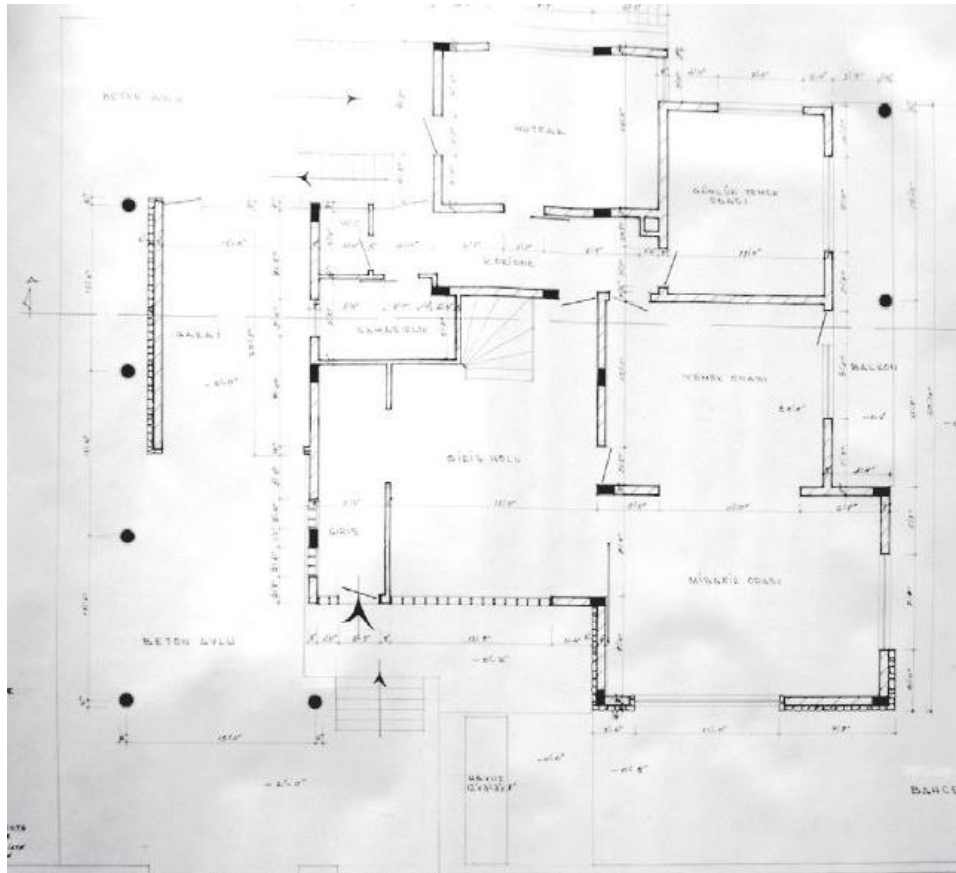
The ground floor of Mısırlızade House (Yavuz, E., 2021, p:28)
